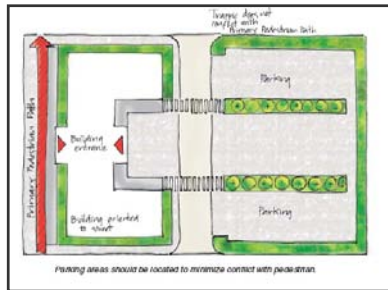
Appropriate placement of parking lots around station with regard to the pedestrian's passageways.
